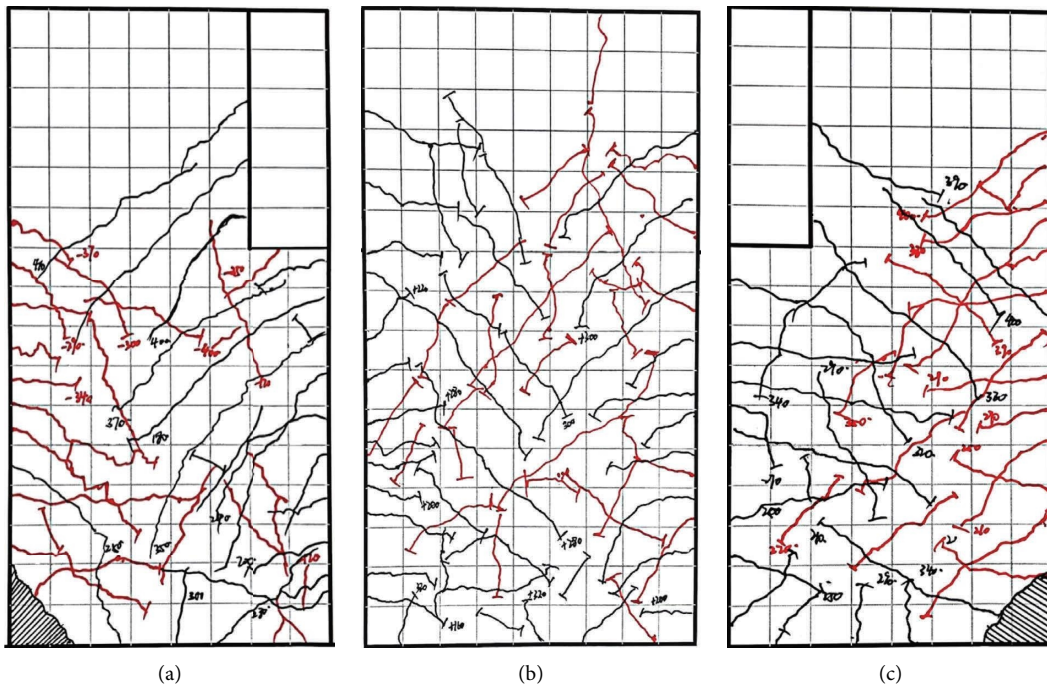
Damage results of URC-Y specimen. (a) Wall limb 1. (b) Web. (c) Wall limb 2.
